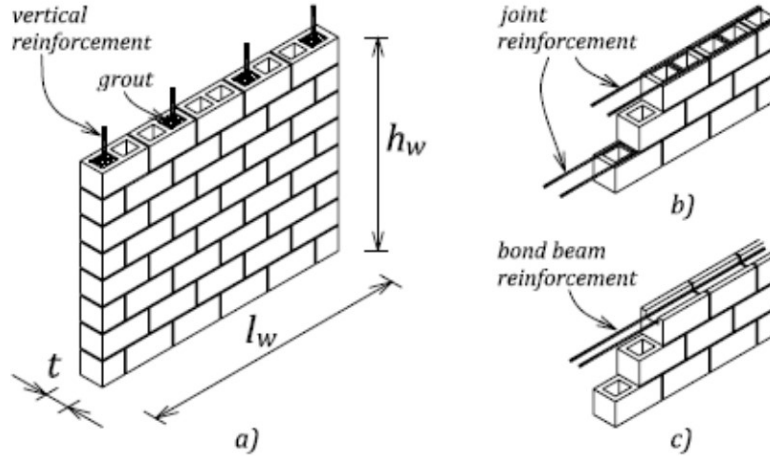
Typical reinforced concrete masonry block wall: (a) vertical reinforcement; (b) joint reinforcement; (c) bond beam reinforcement (Anderson and Brzev 2009)
